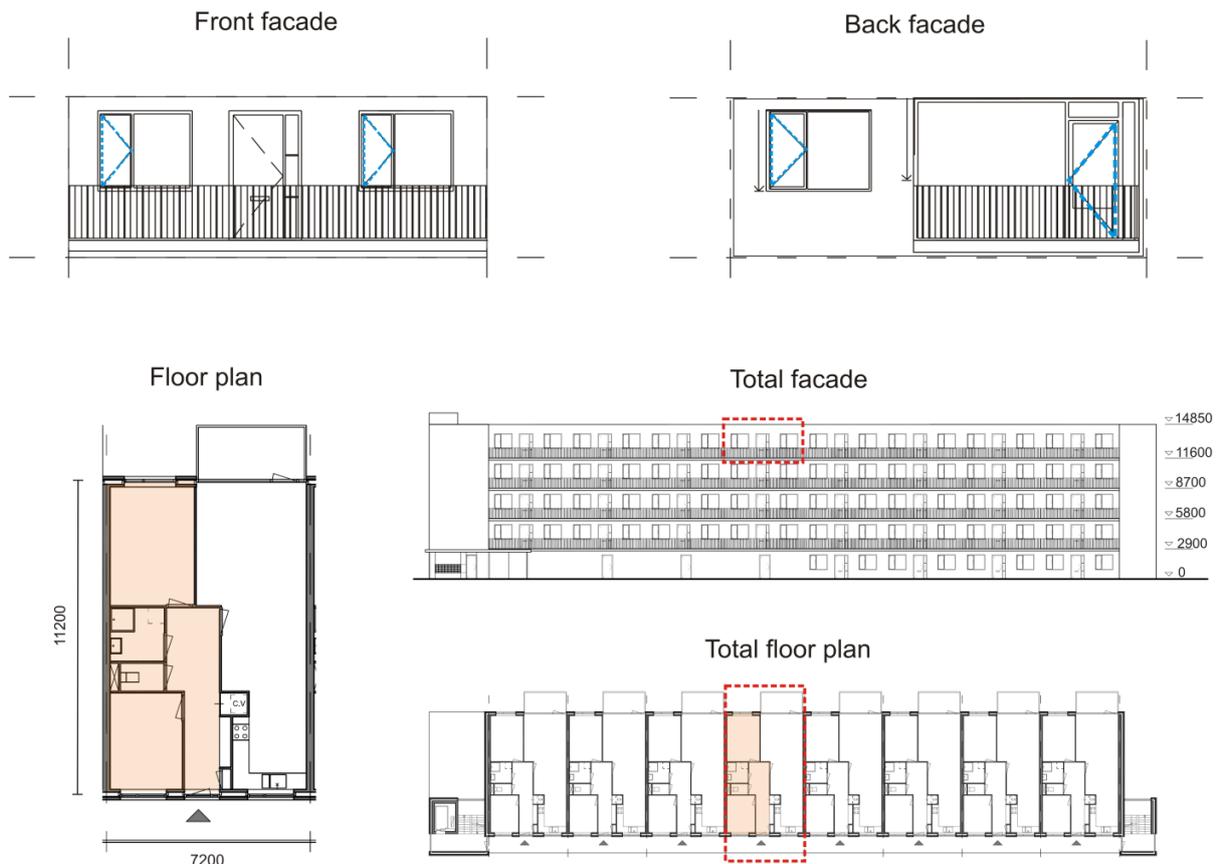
Facades, floor plans and building dimensions of the apartment (modified from [57]). The colored area in the floor plan indicates the zone with the bedrooms. The dashed boxes in the figures of the total facade and total floor plan indicate the apartment under study. Triangles in windows and doors indicate operable windows/doors for the additional ventilation configuration. Dimensions in mm.
